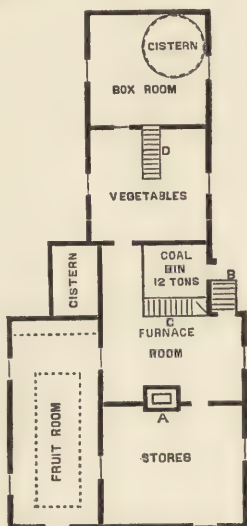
Basement of Dwelling—A, Gothic furnace—B, outside entrance—C, stairs from dining room—D, stairs from kitchen.
